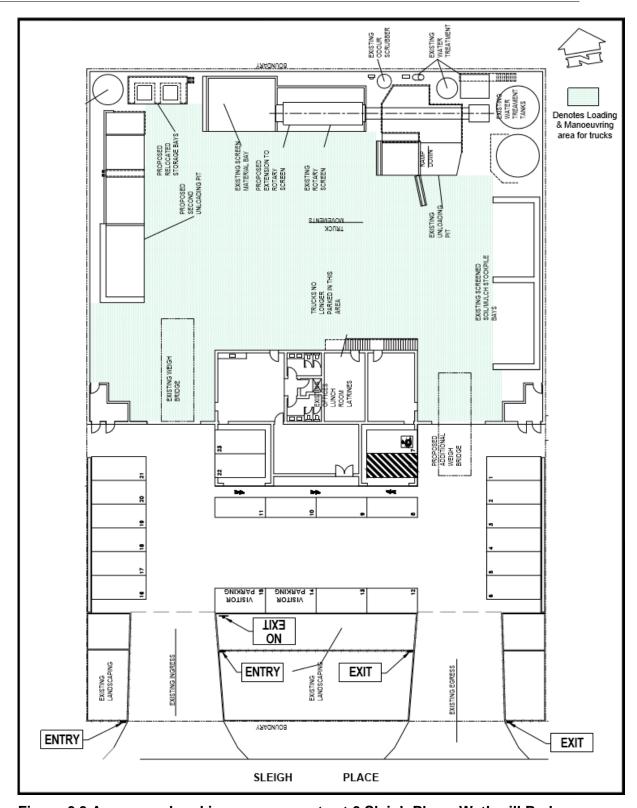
Access and parking arrangements at 6 Sleigh Place, Wetherill Park
